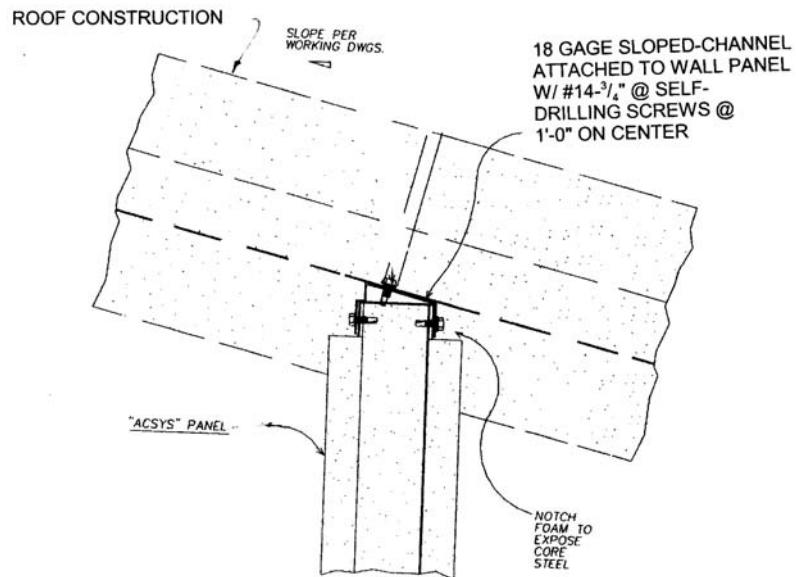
TYPICAL PANEL CONNECTION SHOWING SLOPED CHANNEL
